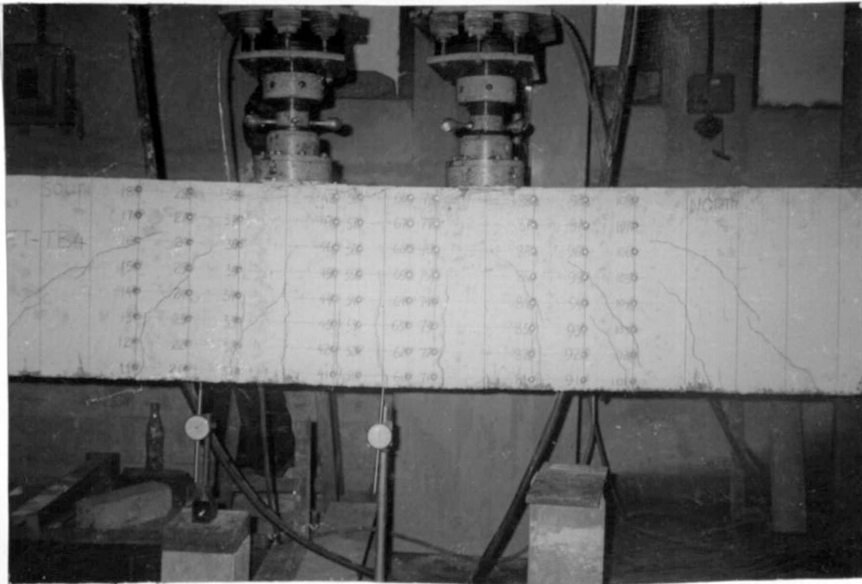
Beam CFT TB4 Near Capacity Loading
